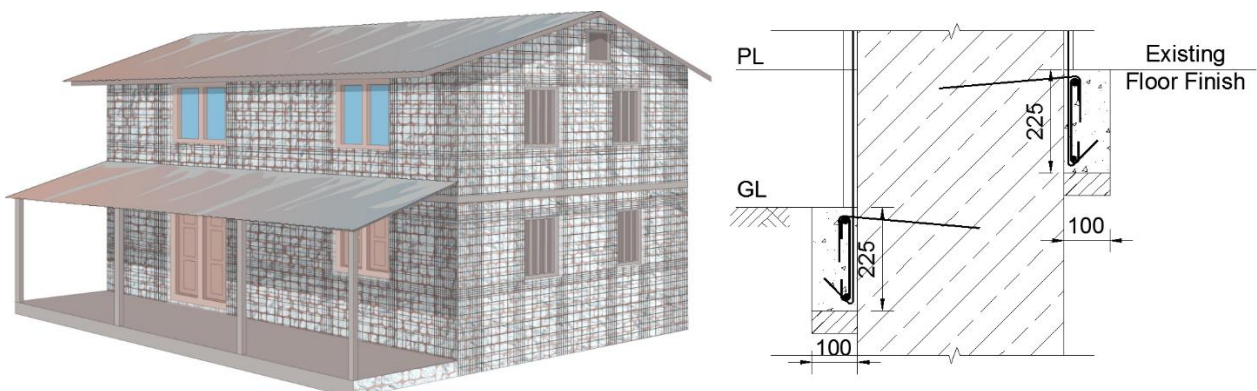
Typical WWM layout (left); RC tie member at the base showing through anchor rods (right)
